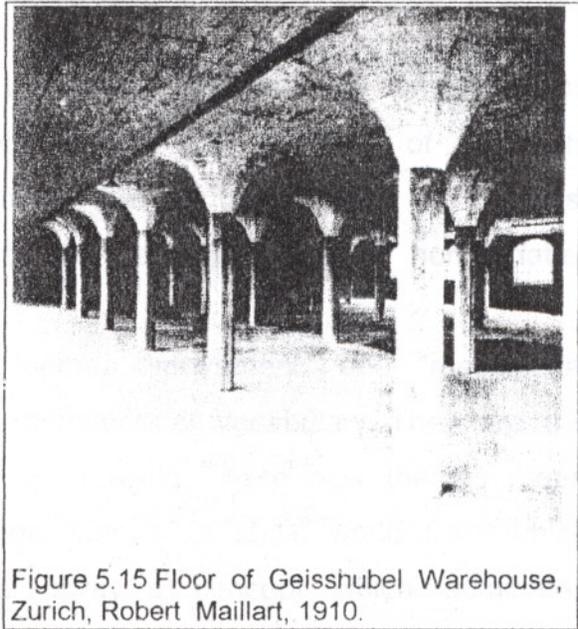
Floor of Geissshubel Warehouse, Zurich, Robert Maillart, 1910.
